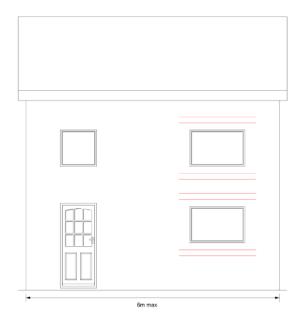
Example of reinforcement above and below openings exceeded 1.5m
